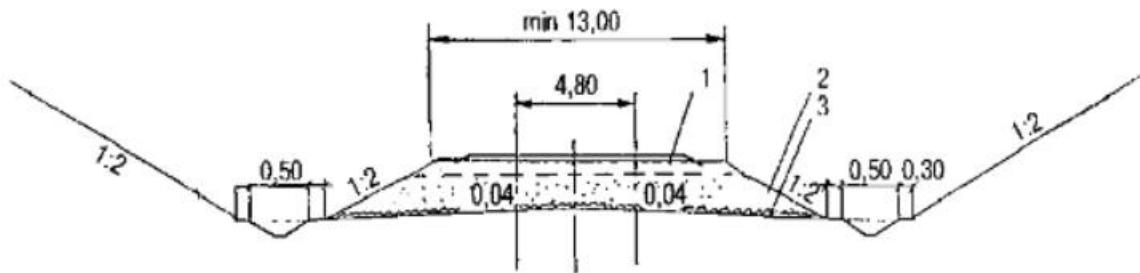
Excavation up to 12 m deep in clay soils: 1 – ballast prism, 2 – protective layer, 3 – geotextile.
